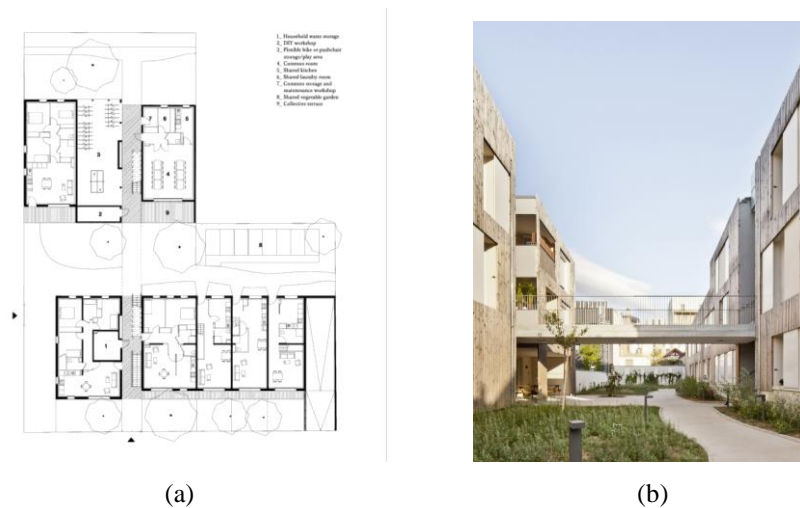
(a) Nanterre Co-Housing ground floor plan and (b) Nanterre footbridge
